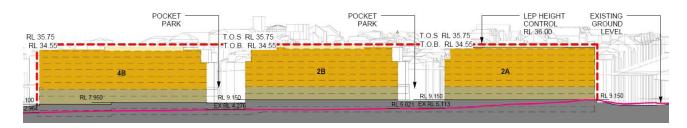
Section (looking east to the future park) showing proposed building envelopes.
